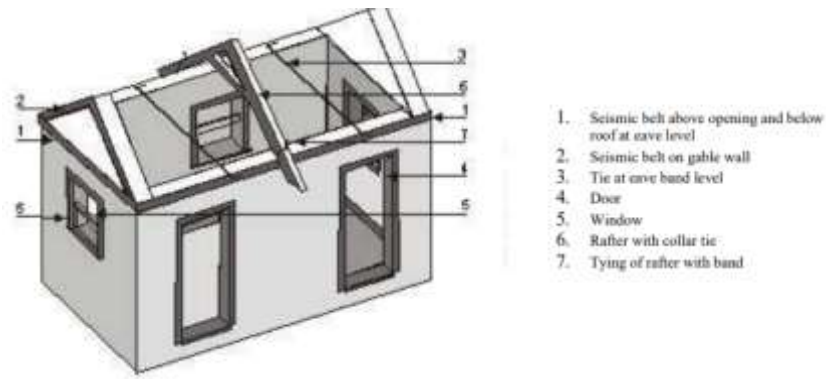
Arrangement of Reinforcing Masonry Building Having Pitched Roof.
